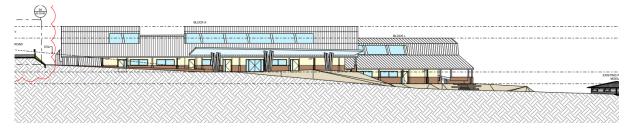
| Approved western elevation (Source: Applicant's Modification Application 2020)
